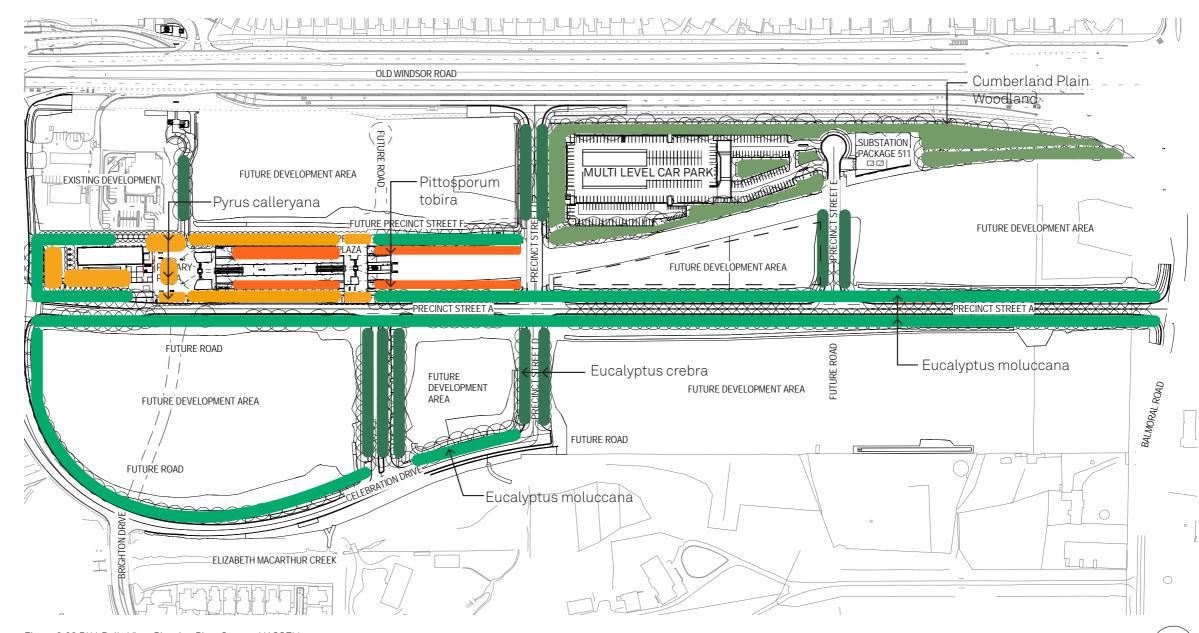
BLV\_Bella Vista Planting Plan. Source: HASSELL.
